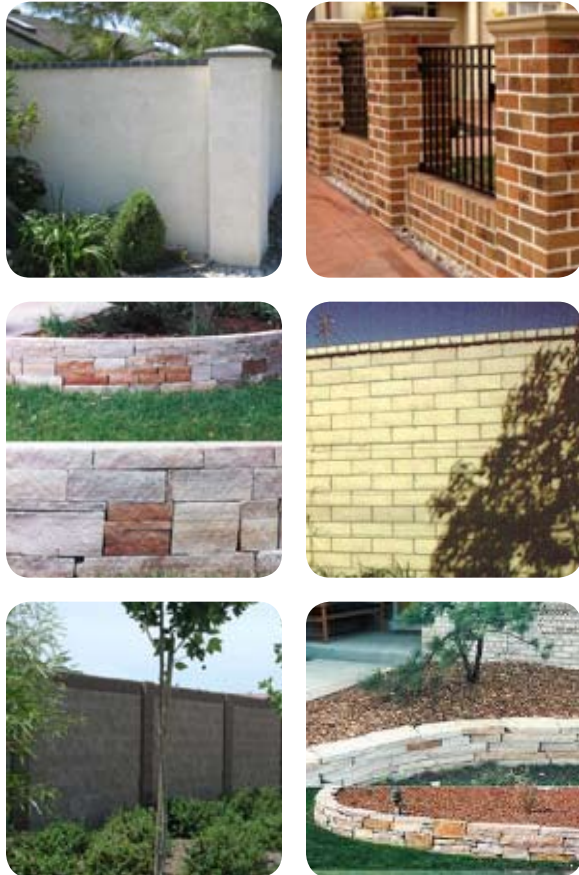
Acceptable wall materials include (clockwise from top right): Brick, Slump Stone, Stack Stone, Split Face Block, Flagstone and Smooth Stucco
